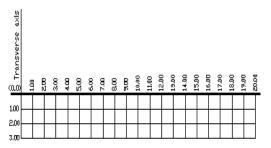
A plan of the scanned paths in El-Kobba bridge deck
